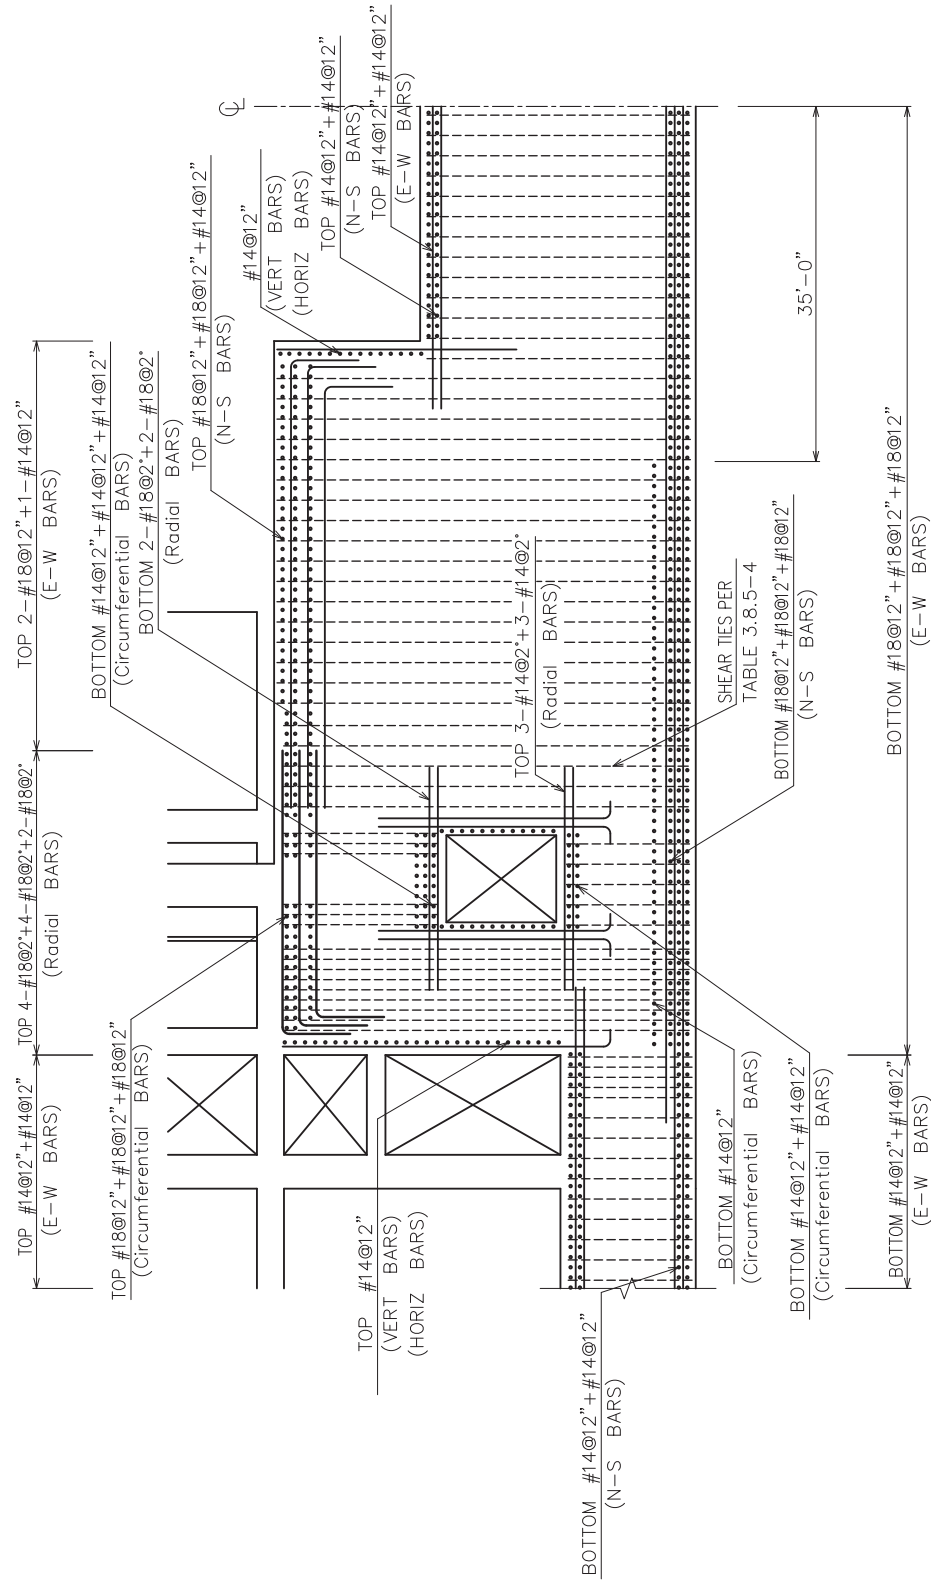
Reinforcing Steel of Basemat: SECTION E-W
